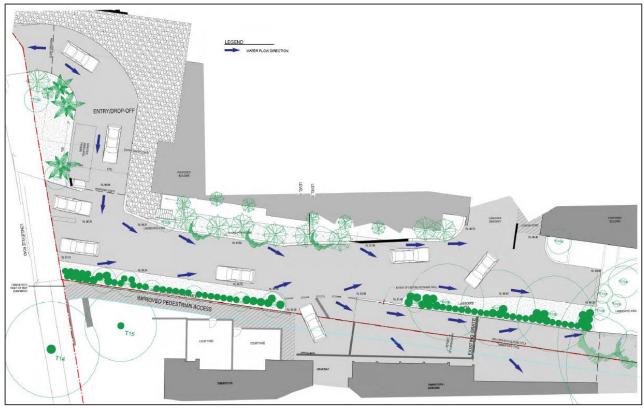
Proposed vehicular access arrangement (source: Thomson Adsett).
